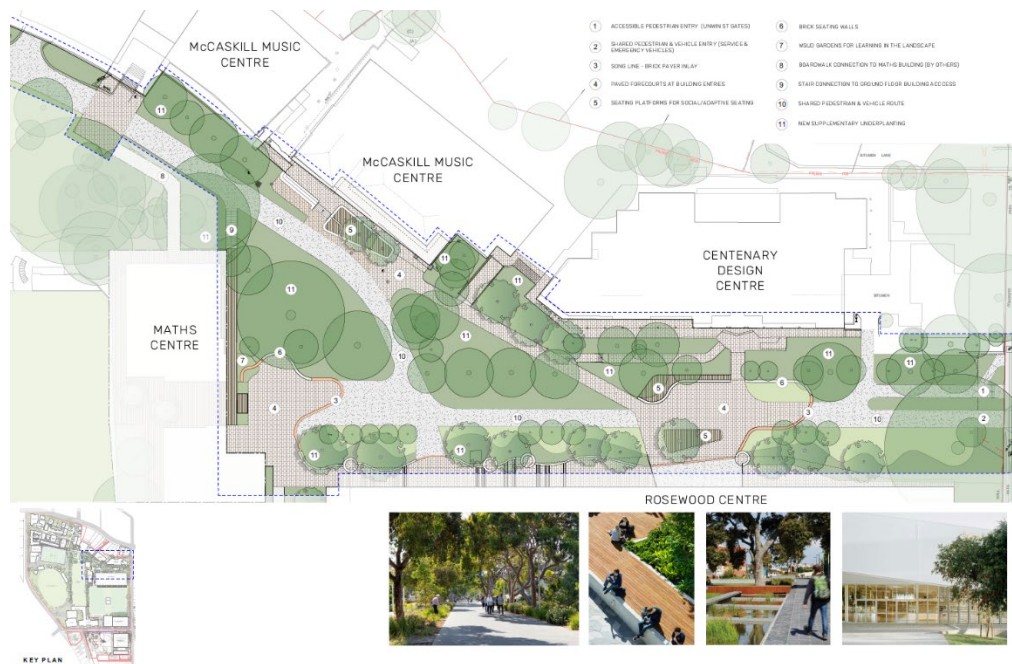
Proposed landscape works to the south of the Centenary Design Centre. (Source: 360 Degrees Landscape Architecture)
